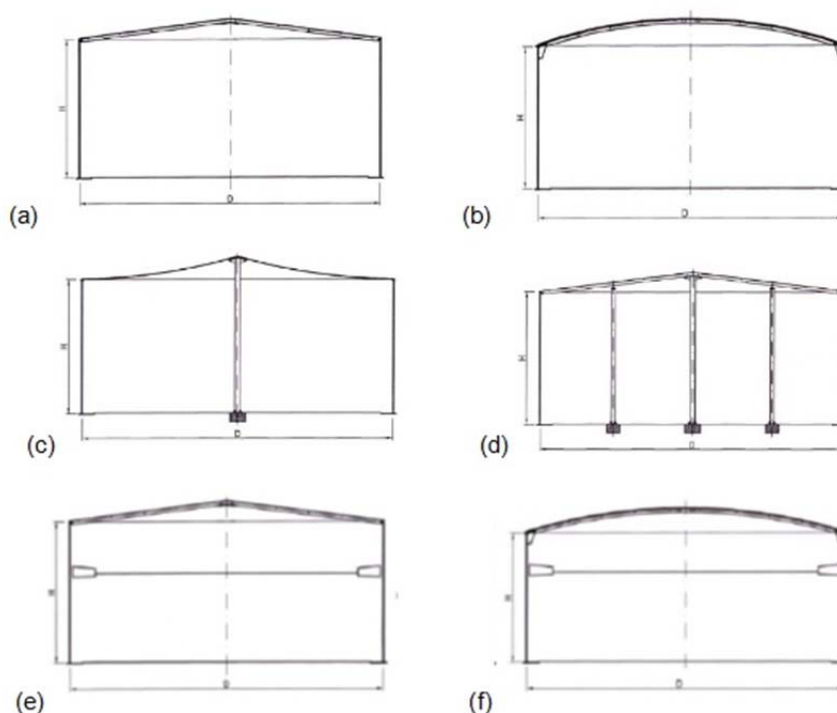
(a) Cone Roof, (b) Dome Roof, (c) Hanging Roofs, (d) Umbrella Roof, (e,f) Fixed Roofs (Dome Or Cone) With Internal Floating Roof.
